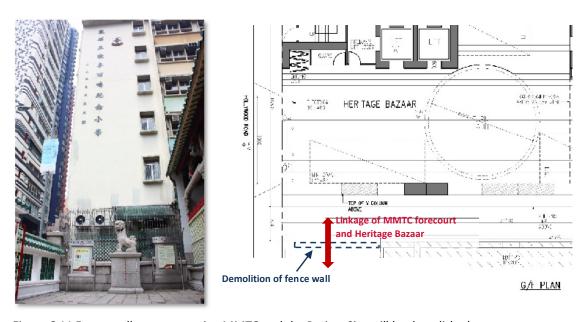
Fence wall now separating MMTC and the Project Site will be demolished
